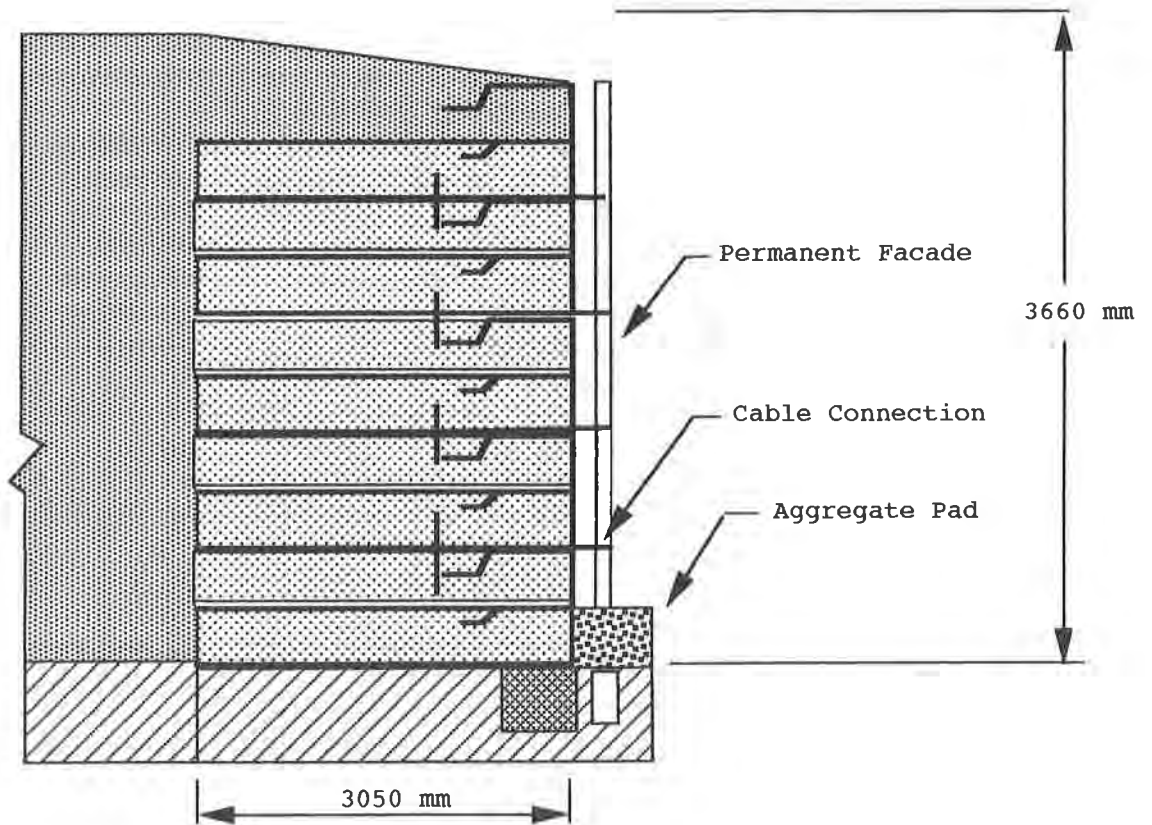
After Completion of Wall, Cable Supports Are Used To Support Permanent Facade.
